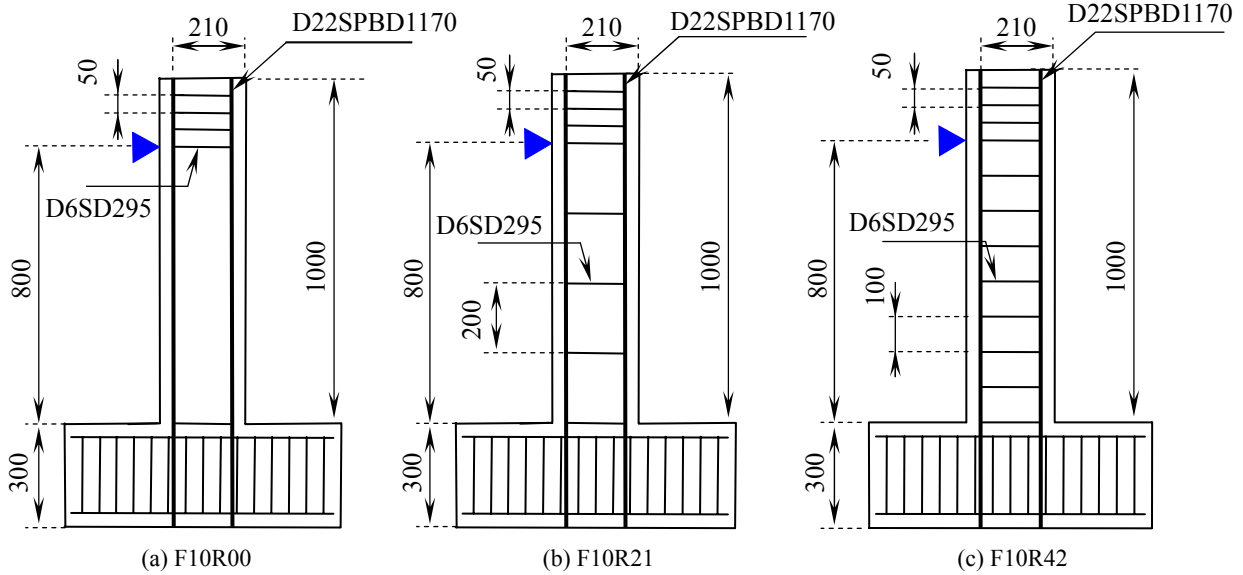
Specimen geometry and reinforcement layout (unit: mm)
